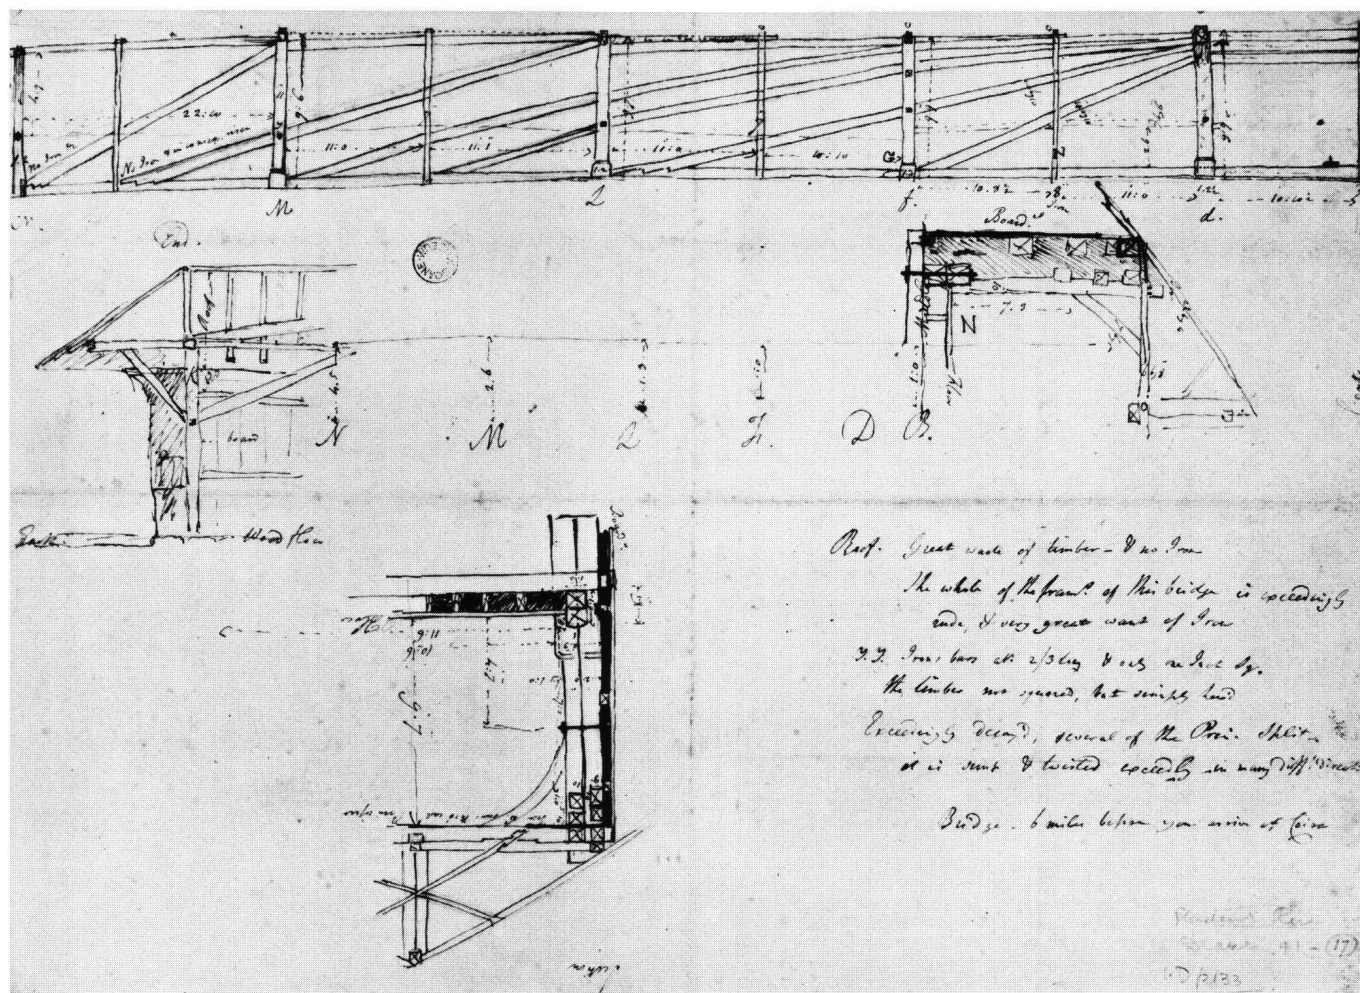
John Soane: short bridge at Reichenau; drawing showing sections
